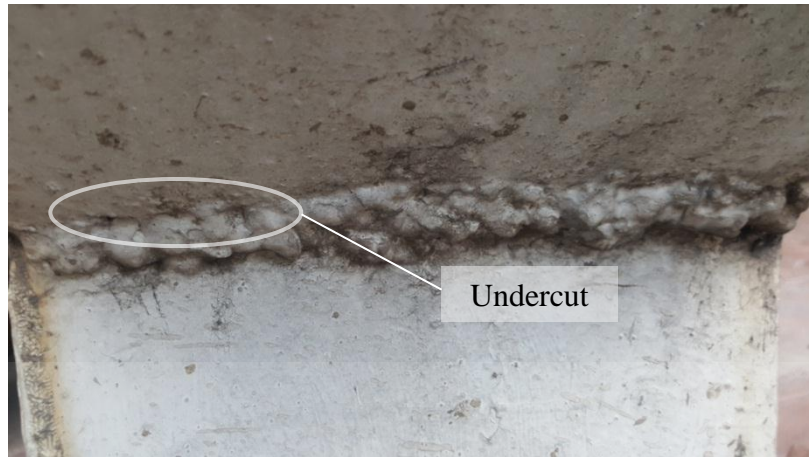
Welding defects on Steel Structure B (joint 5)
